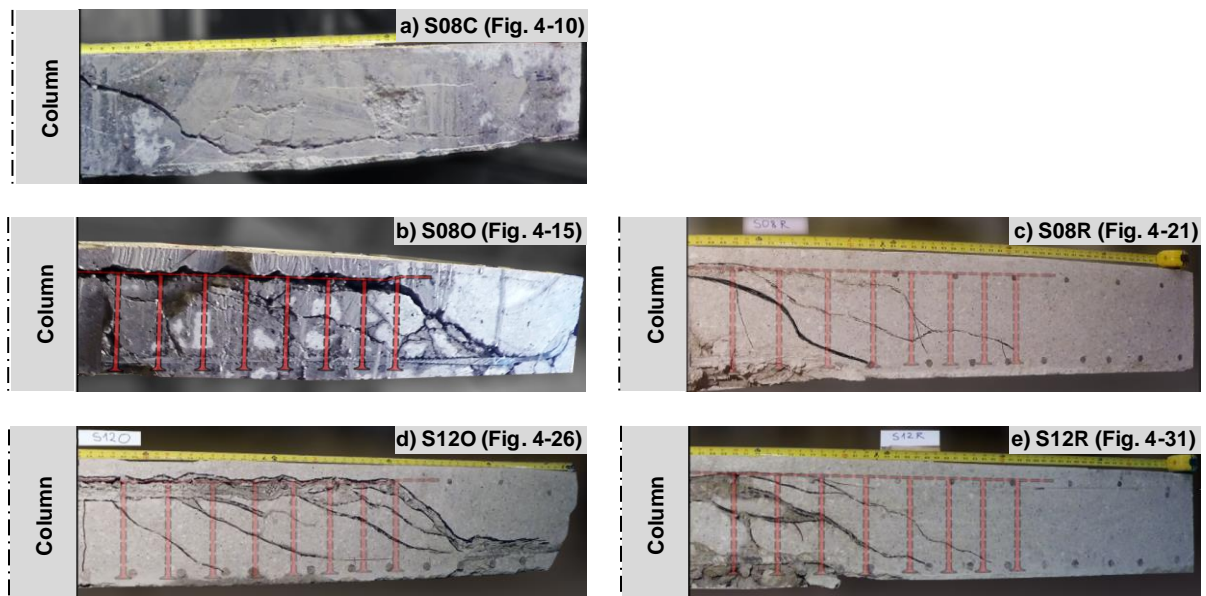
Inclined cracks and failure surfaces on cut sections
